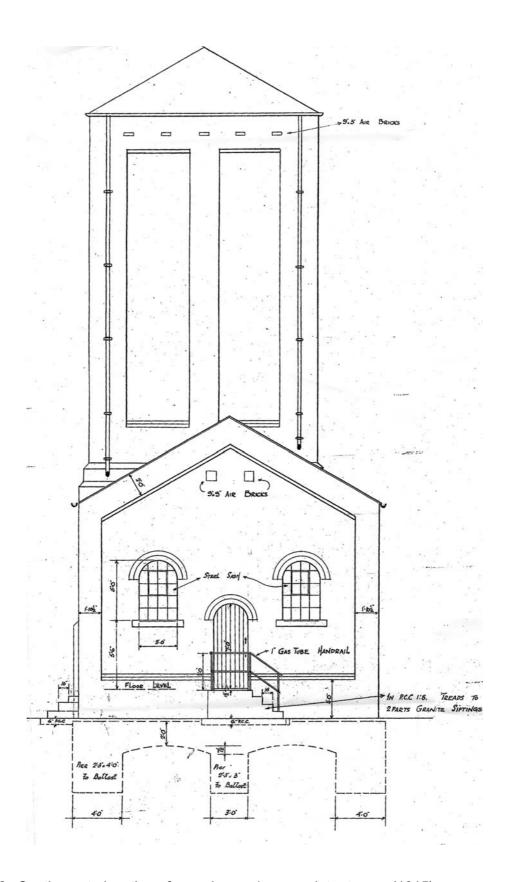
South-west elevation of pumphouse / accumulator tower, (1915)
